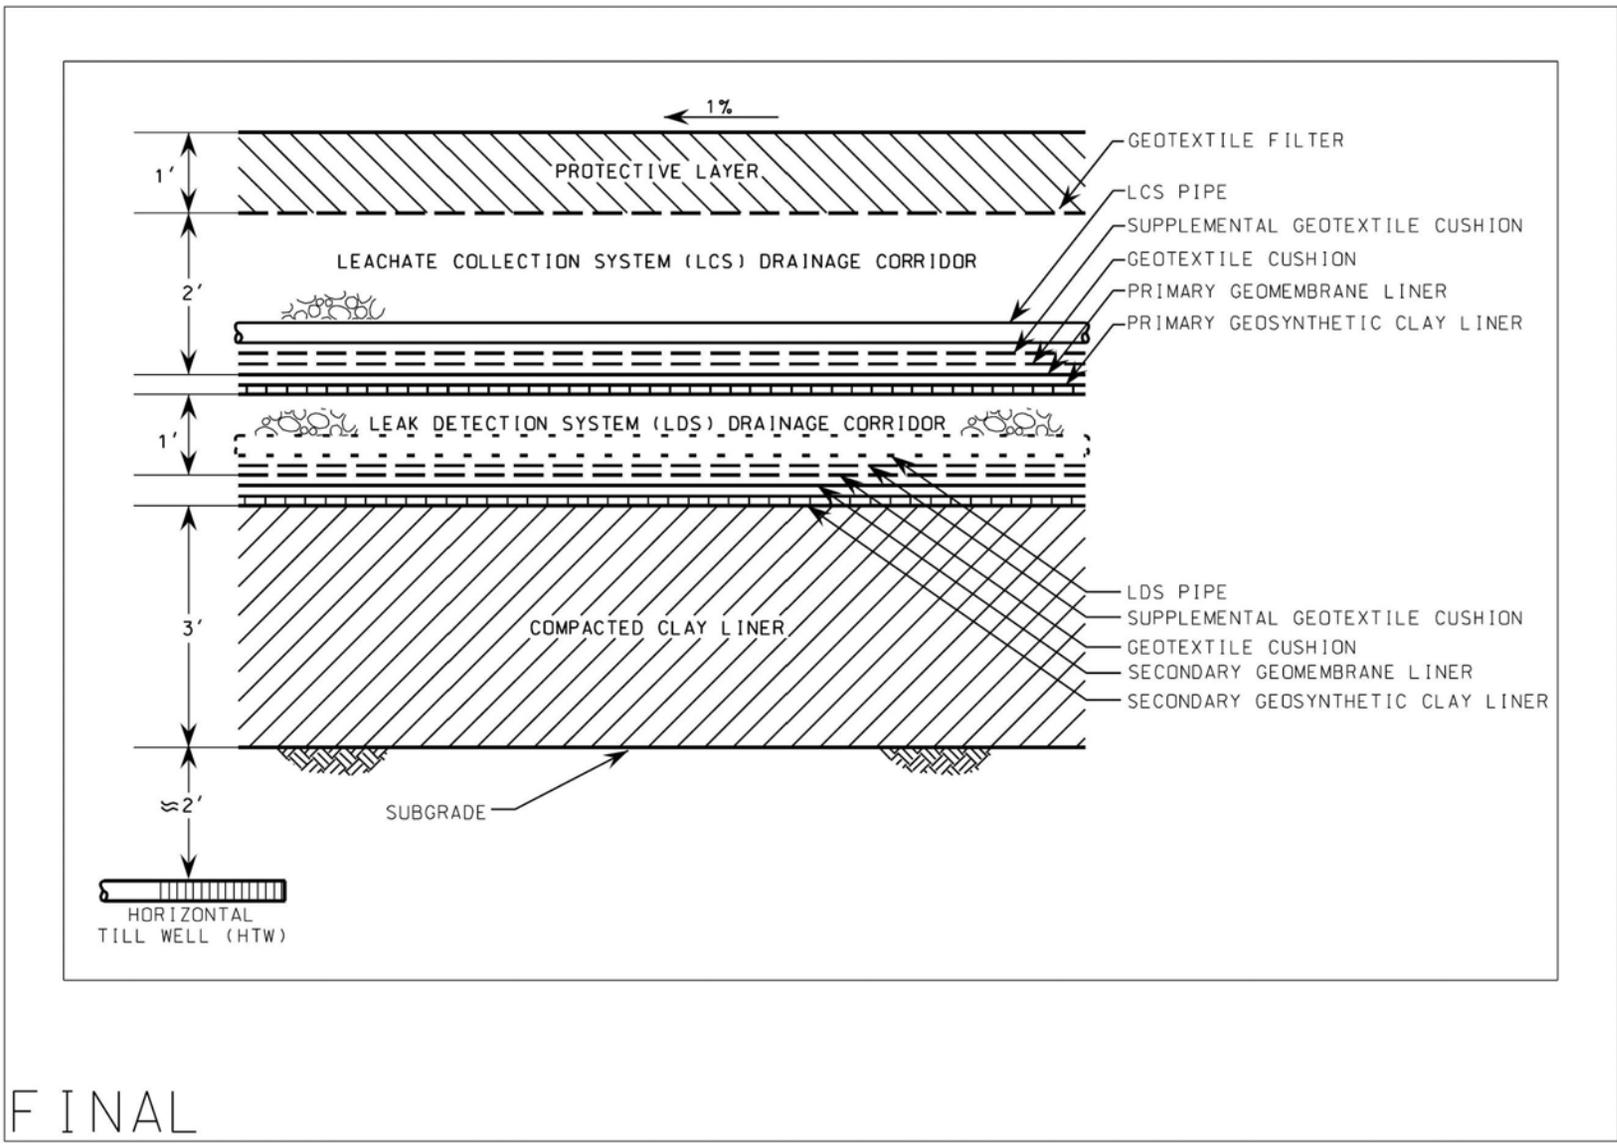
On-Site Disposal Facility Liner System with HTW at the Drainage Corridor
